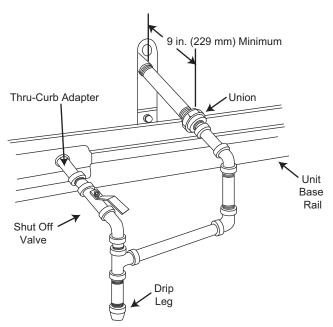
Gas Piping, Typical Curb Sidewall Piping (Example 1)
